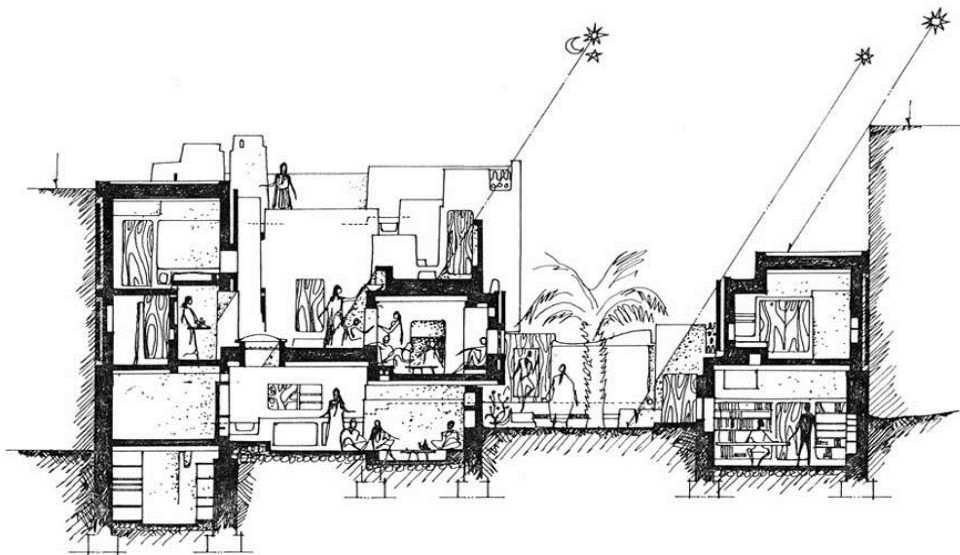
Section of patio house in Ghardaia city (Algeria), Source: Andre Ravereau
